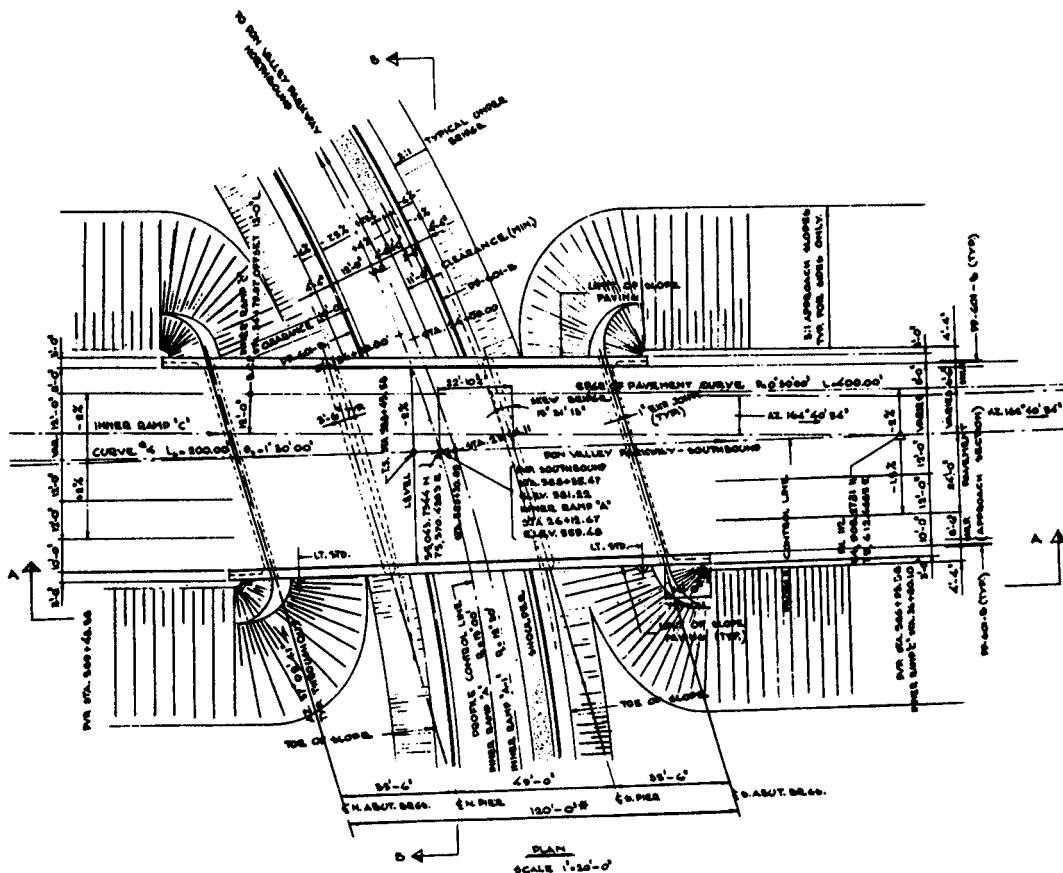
Key plan and general layout for Bridge No. 5, Don Valley Parkway, and Highway 401 East off ramp.
